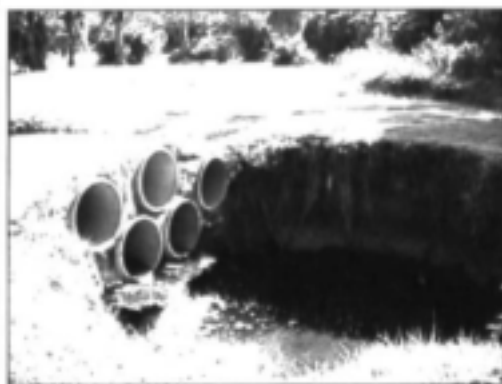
Bridge with culverts over mid-Reach 6. Note the bank scour downstream of the bridge.
